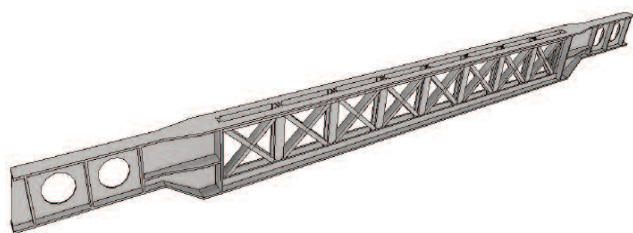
The MSC 23-150 plate-and-truss beam concept *Fig. own work
